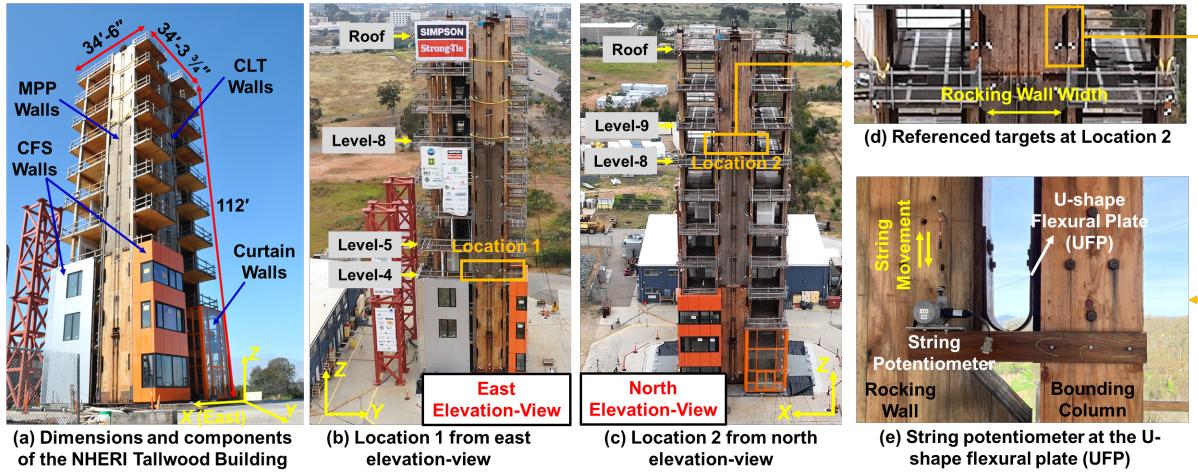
The components and overview of the 10-story mass timber building specimen (NHERI Tallwood).
